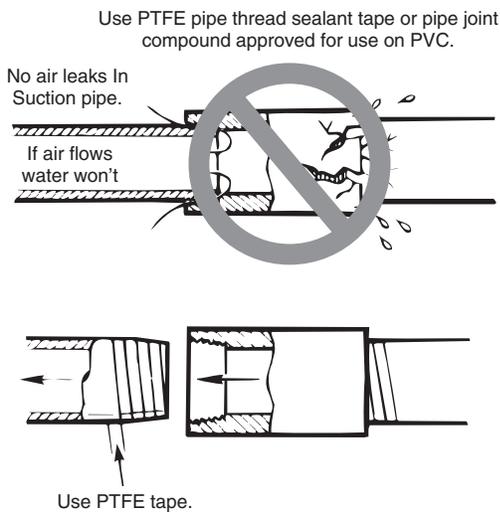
Use PTFE pipe thread sealant tape on pipe joints and connections to pump.
